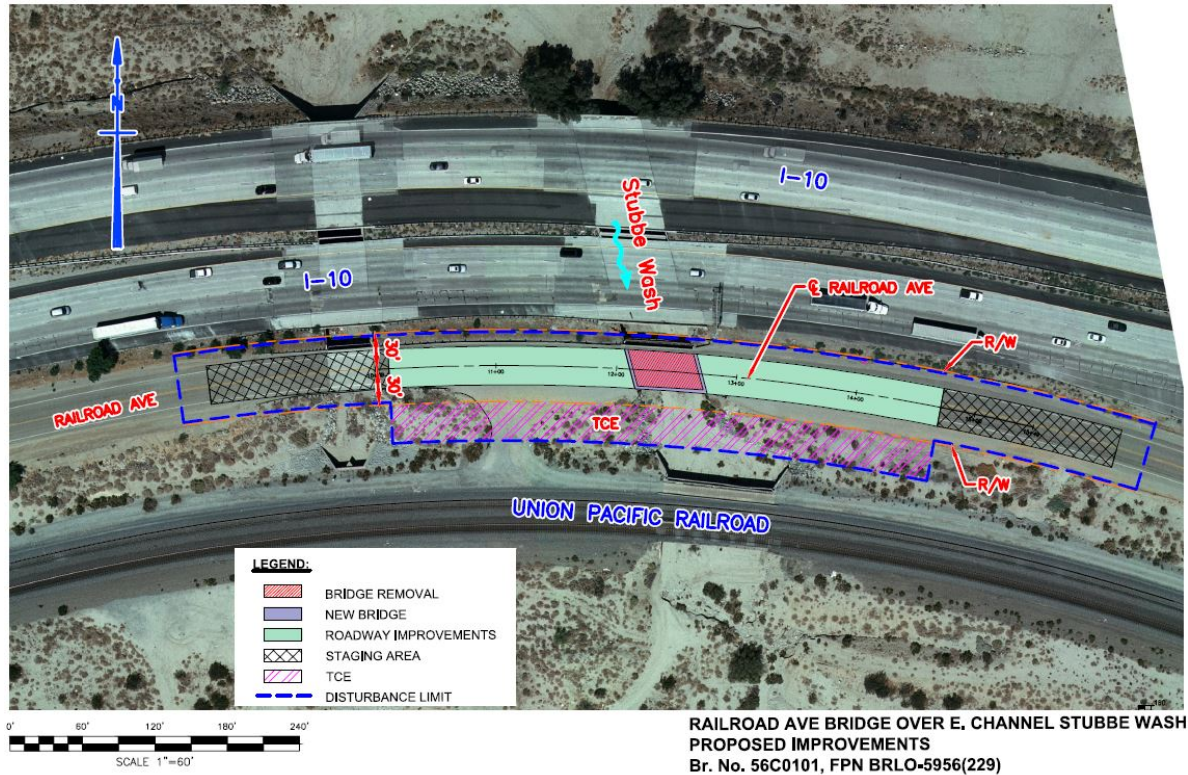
Proposed Improvements for Bridge over Stubbe Wash
